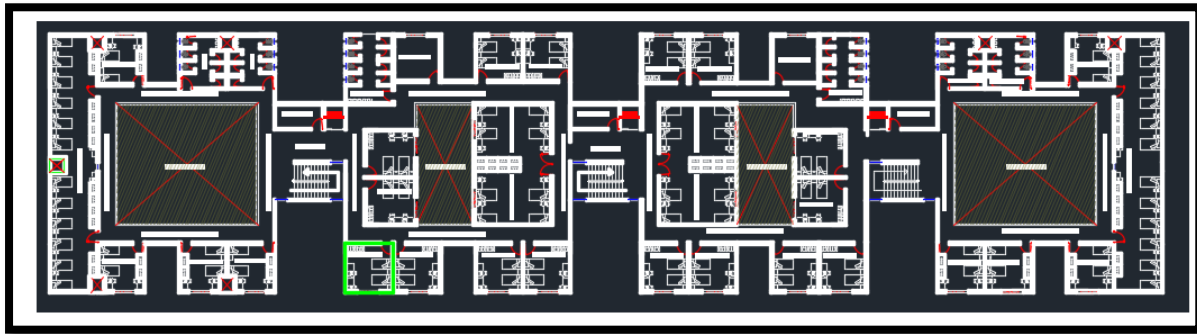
LAYOUT OF COLLEGE CAMPUS.
